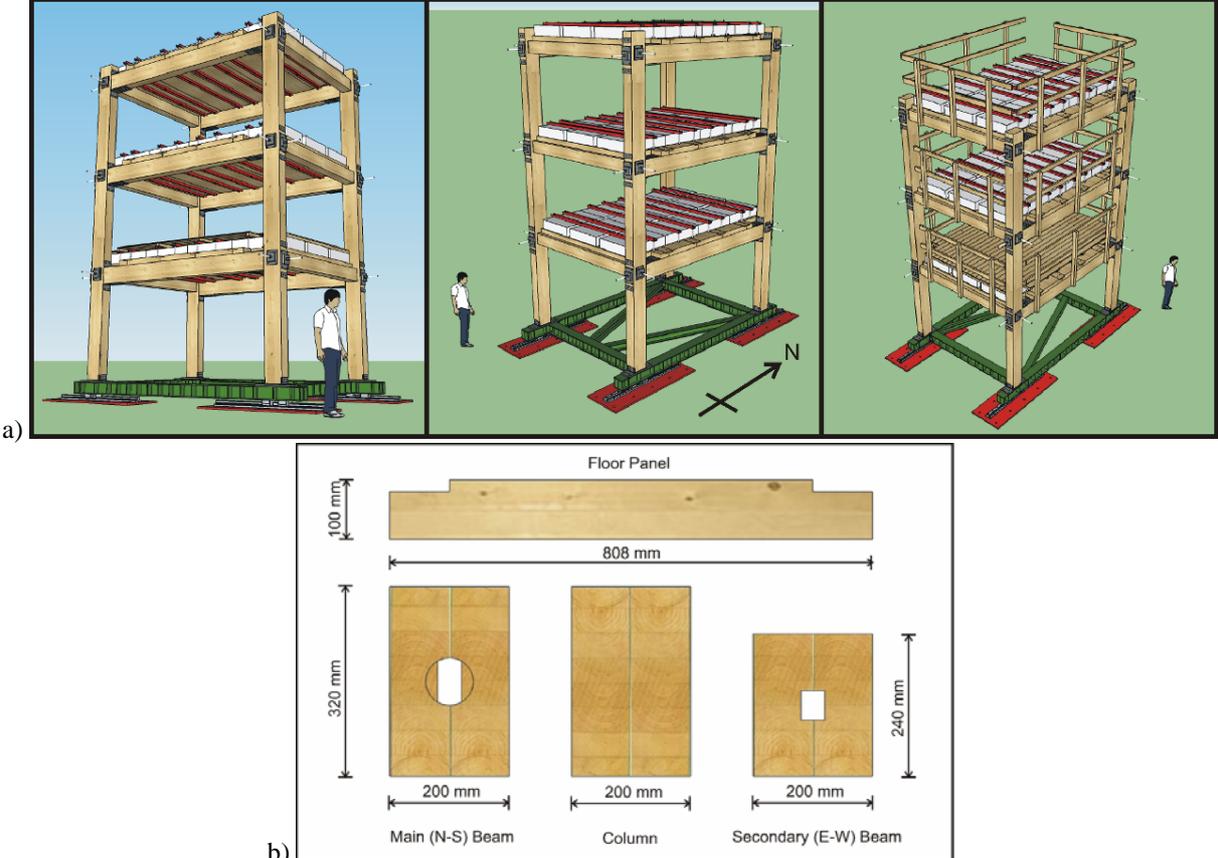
a) 2/3 Scale Post-Tensioned Glulam Test Frame b) Section Sizes Used in Glulam Test Frame
